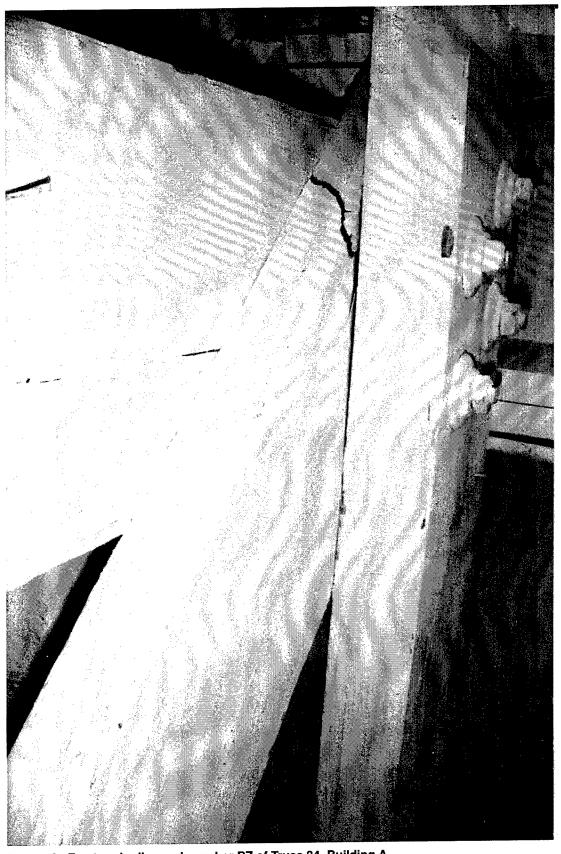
Fracture in diagonal member BZ of Truss 34, Building A.
